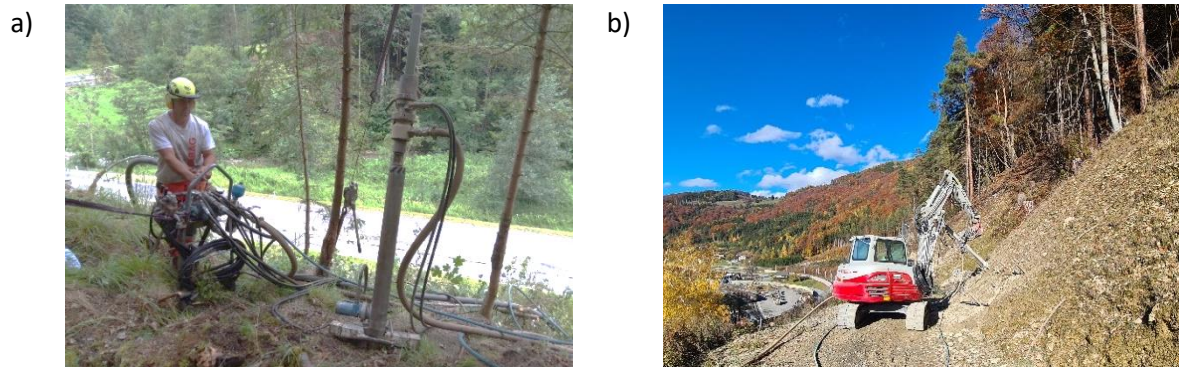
Micropile installation under challenging conditions, hand drill carriage (a), hydraulic drill carriage attached to an excavator (b).
